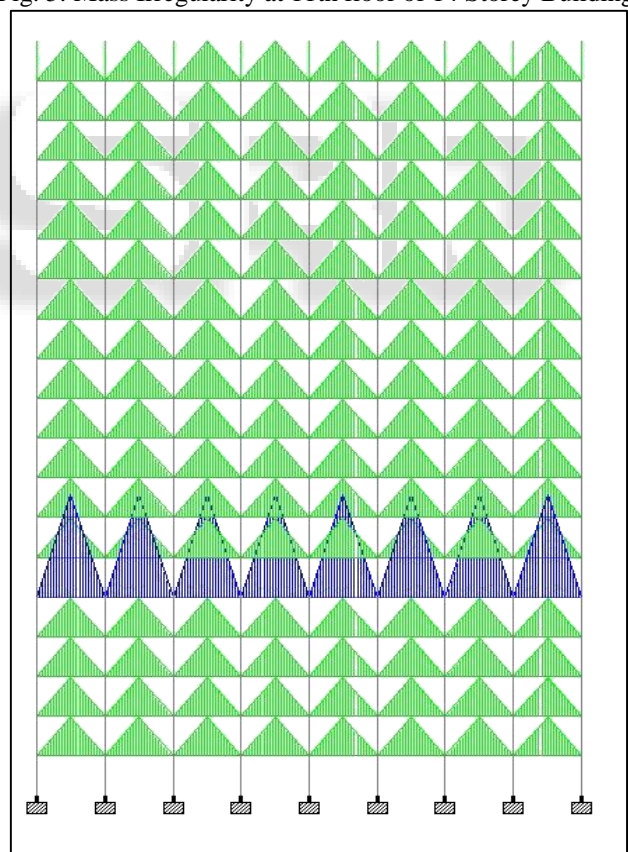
Mass Irregularity at 6th floor of 18 Storey Building.
